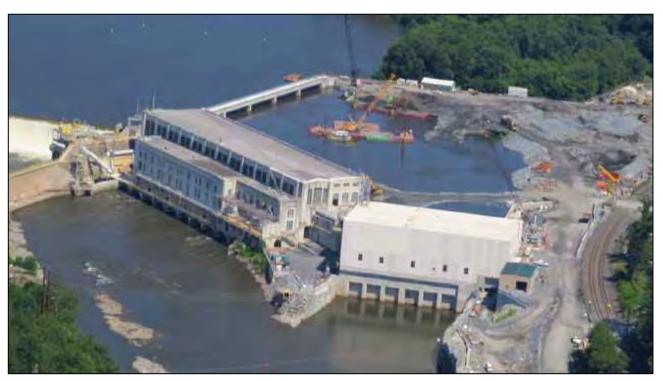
AERIAL VIEW OF NEW POWERHOUSE CONSTRUCTION ON JUNE 15, 2013
